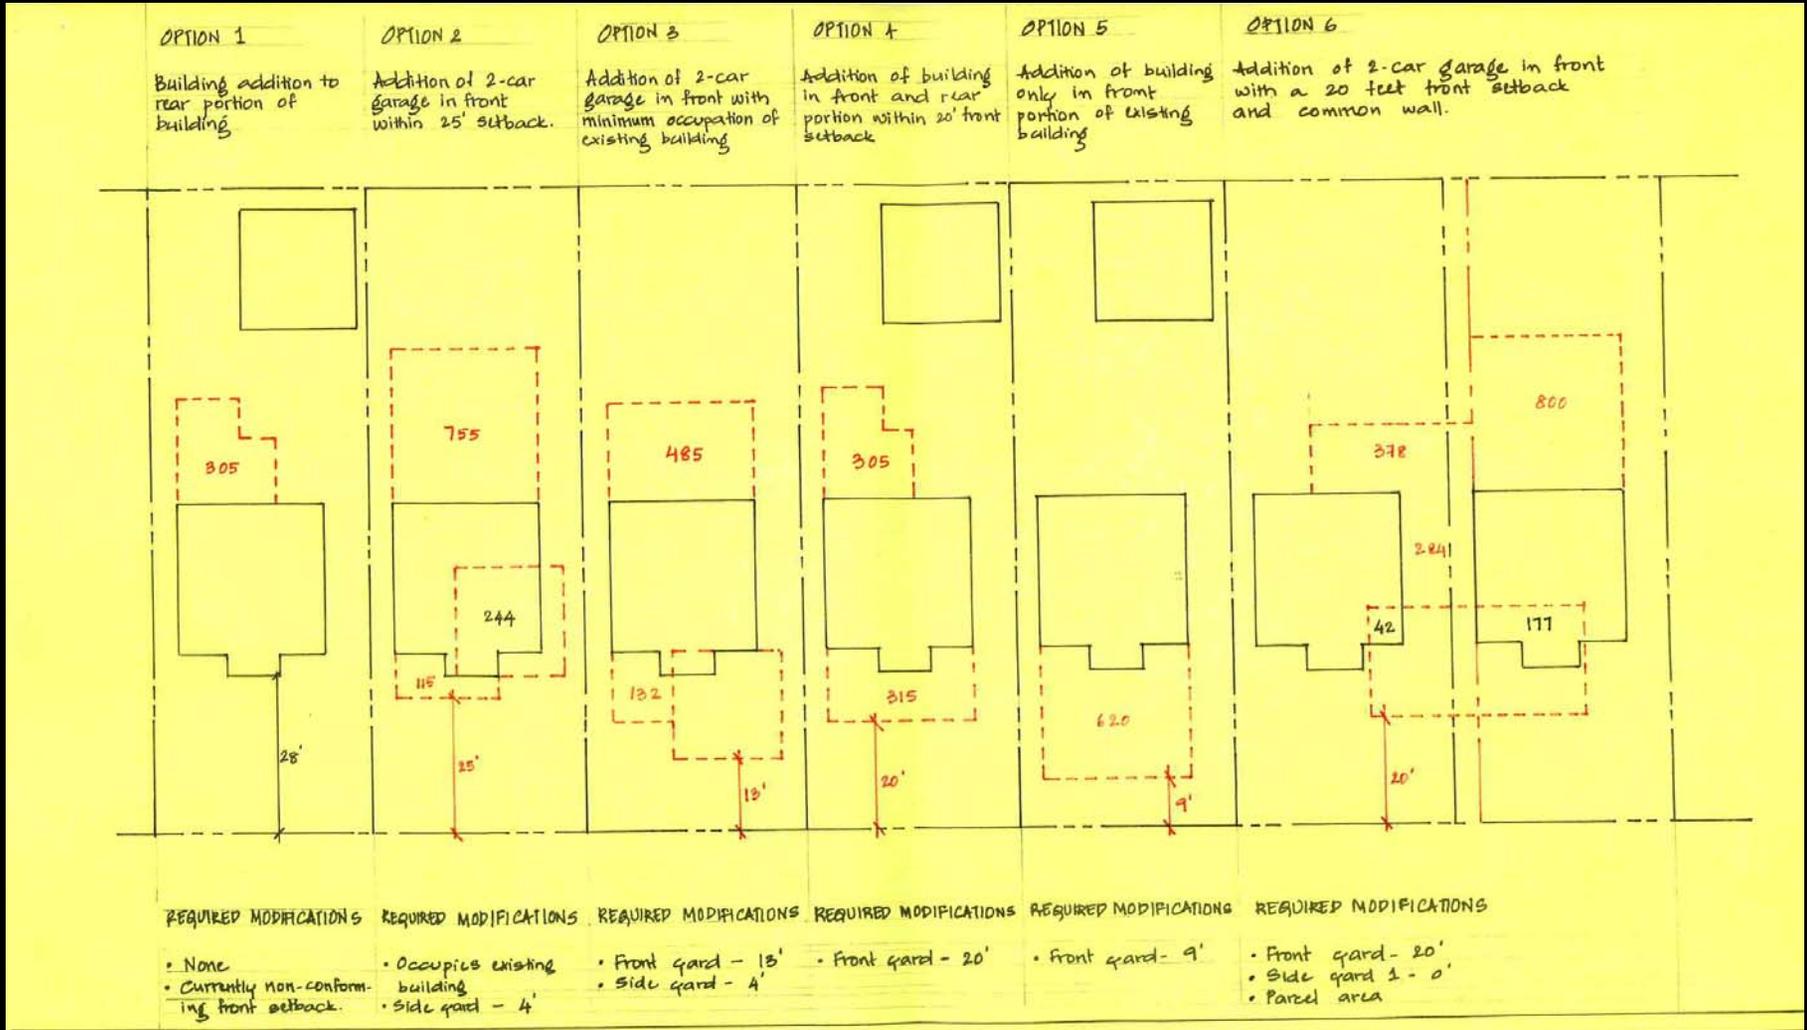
R-40 AREA 2 - POSSIBLE BUILDING CONFIGURATIONS
